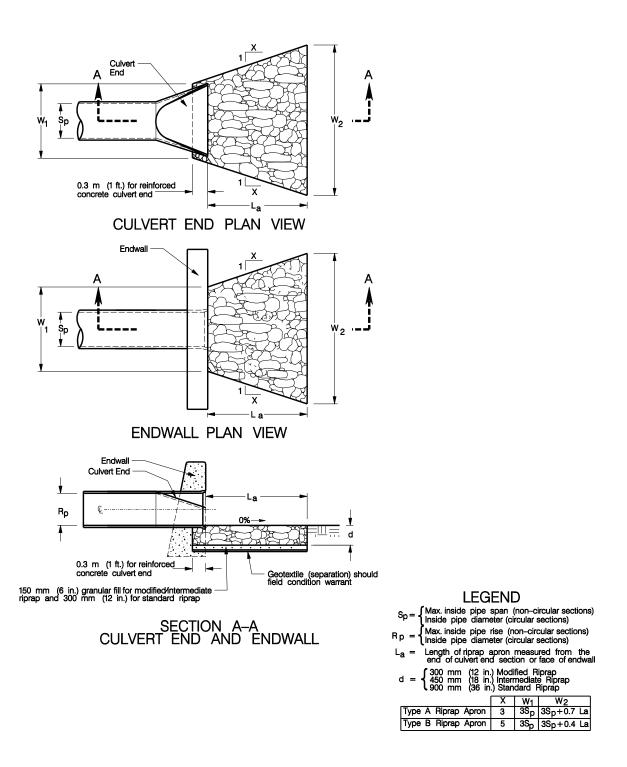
Type A and B Riprap Apron (to be used where there is no defined channel downstream of the outlet)
